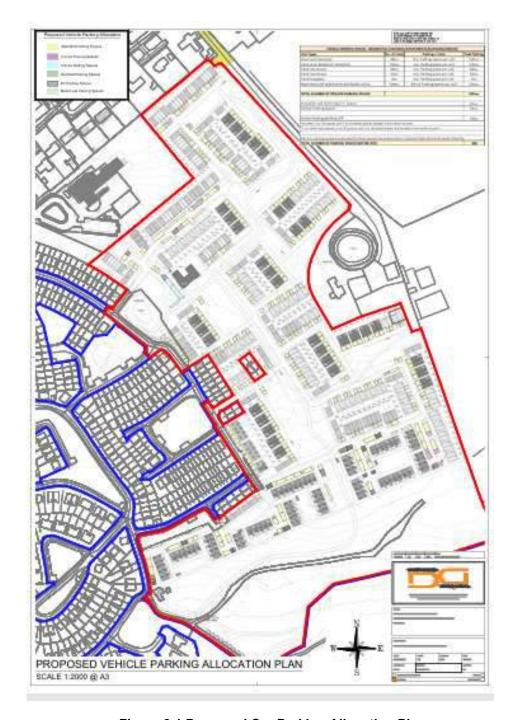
Proposed Car Parking Allocation Plan (Source: Deady Gahan Architects)
